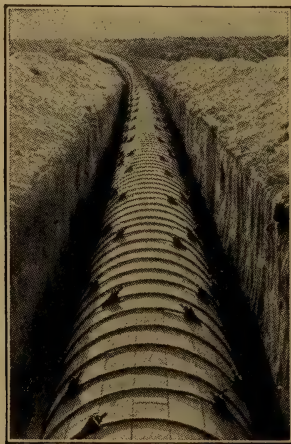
Thirty-six Inch Continuous Wooden Stave Pipe for Irrigation System.
